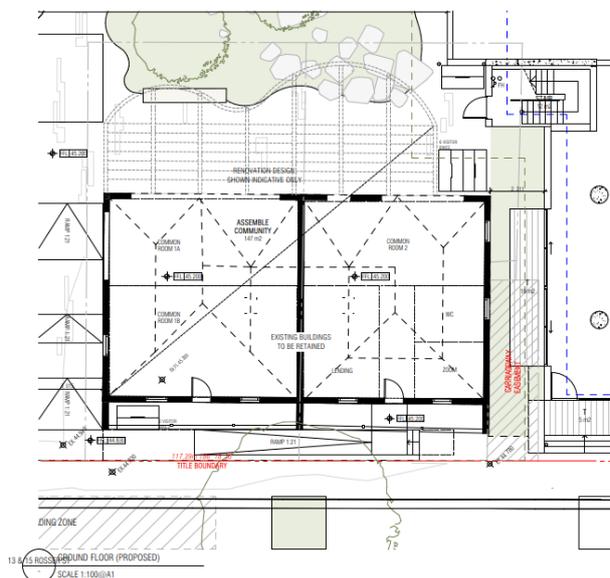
Excerpt Architectural Plans - 13-15 Rosser Street Proposed Ground Floor (Fieldwork)
